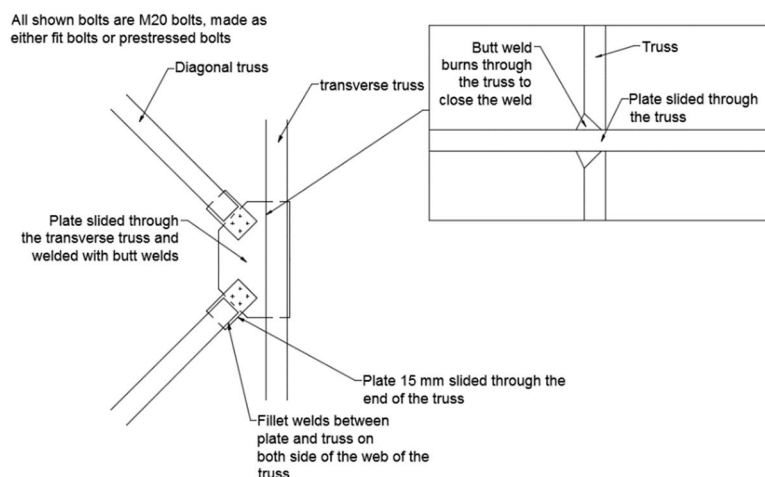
Solution for the connection between the diagonal and the transverse trusses in the K-shaped truss system
